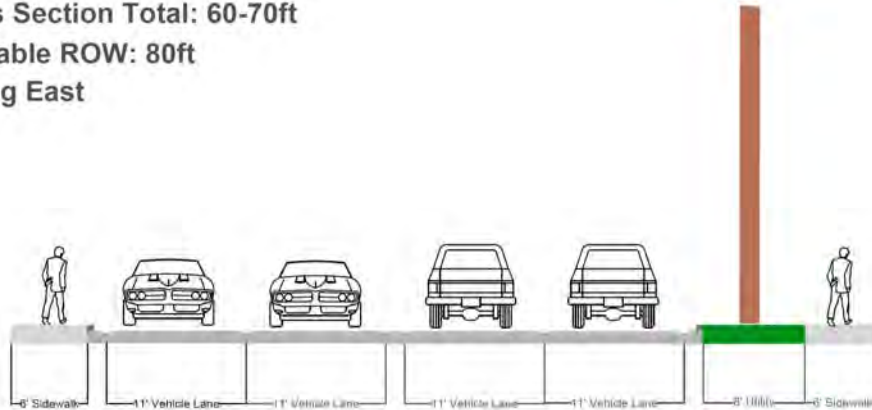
ROUTE 28 CENTERVILLE FOUR-LANE SEGMENT CROSS-SECTION - EXISTING CONDITIONS
